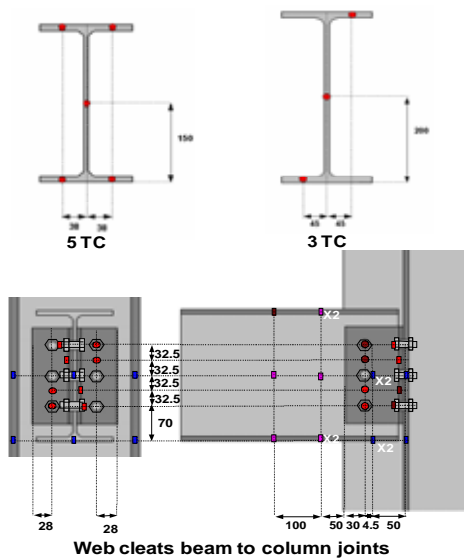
Location of thermocouples on each instrumented steelwork cross section
